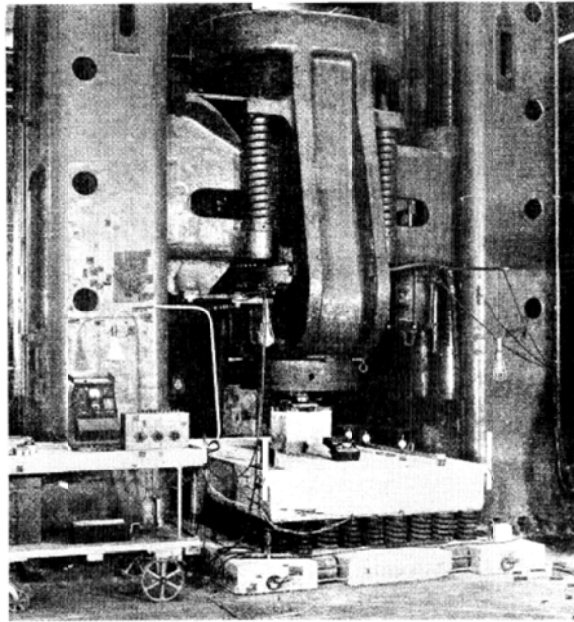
Rectangular footing in test machine (Richart, 1948).
